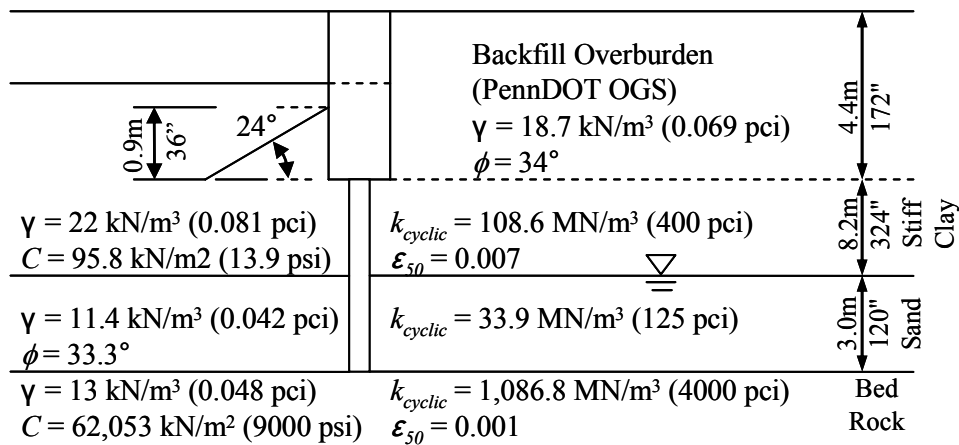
Soil Properties under Bridge 211 Abutment 1.
